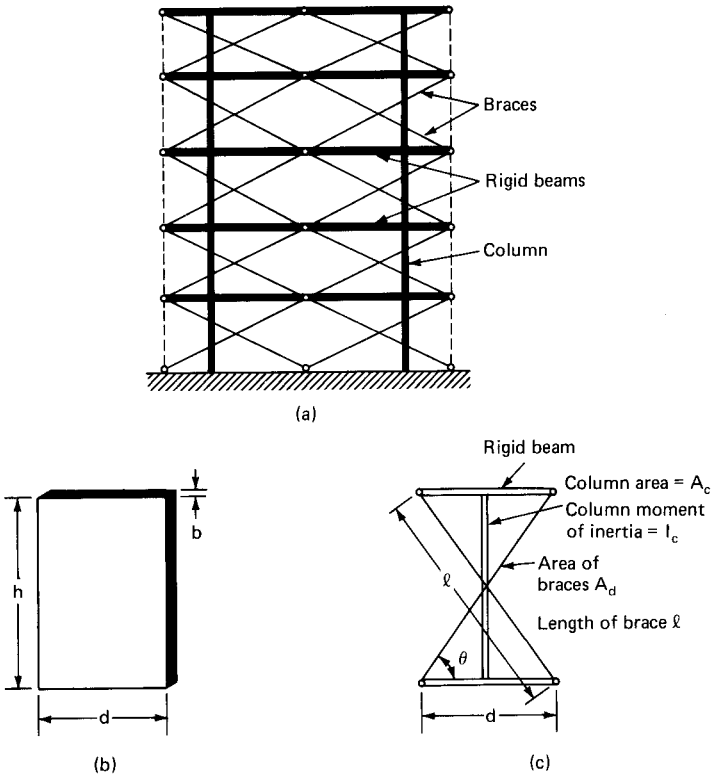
(a) Braced wide-column model for continuously connected shear walls; (b) braced wide-column model for story-high wall.
